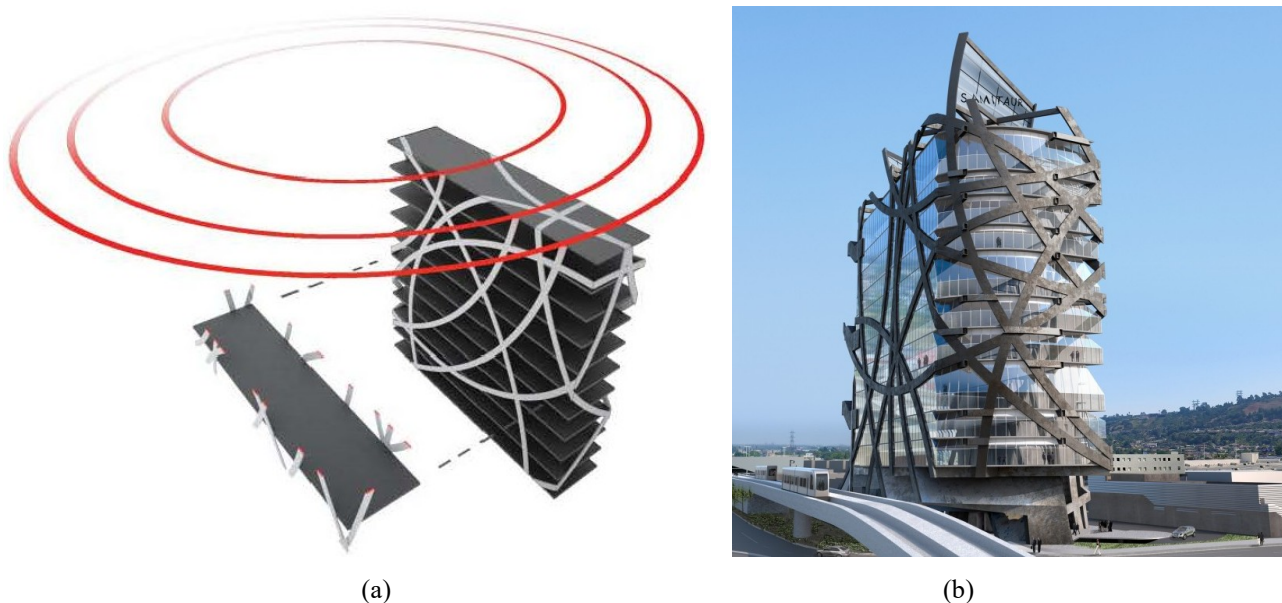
(W)rapper Tower steel exoskeleton concept (a) and rendering from Northwest (b) (Eric Owen Moss)
